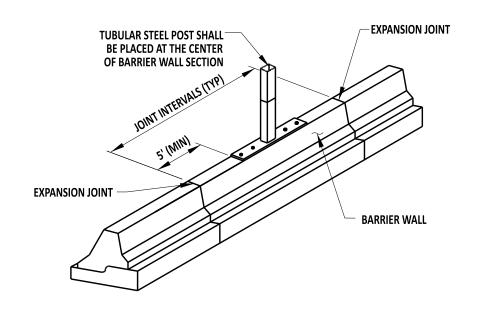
# DETAIL 'A' - SIDE VIEW CONCRETE BARRIER
